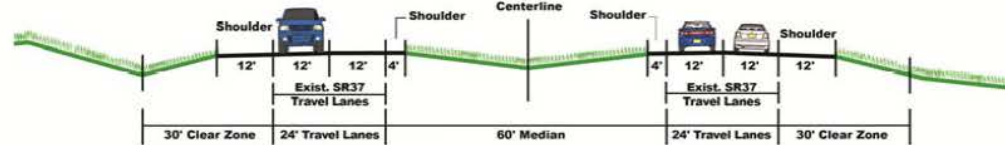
Conceptual Typical Sections for Alternatives 6, 7, 8 and Refined Preferred Alternative 8
